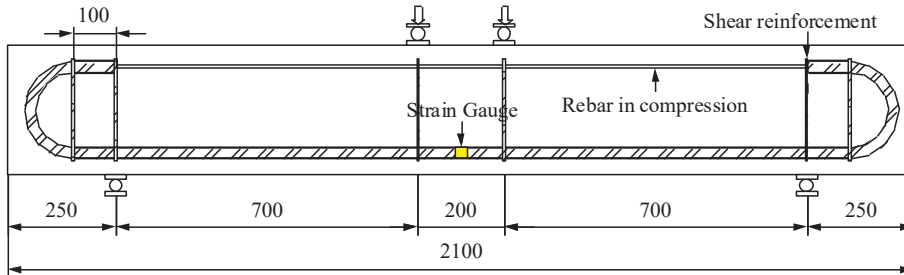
Dimensions and reinforcement details of RC-00 and RE-00
